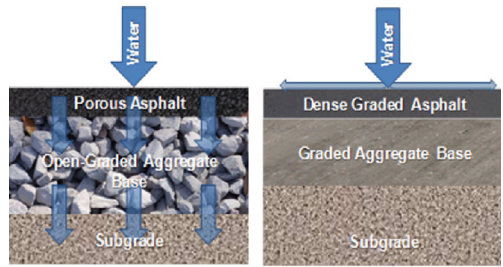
Asphalt Pavement and Low-Noise Asphalt Pavement Shape
